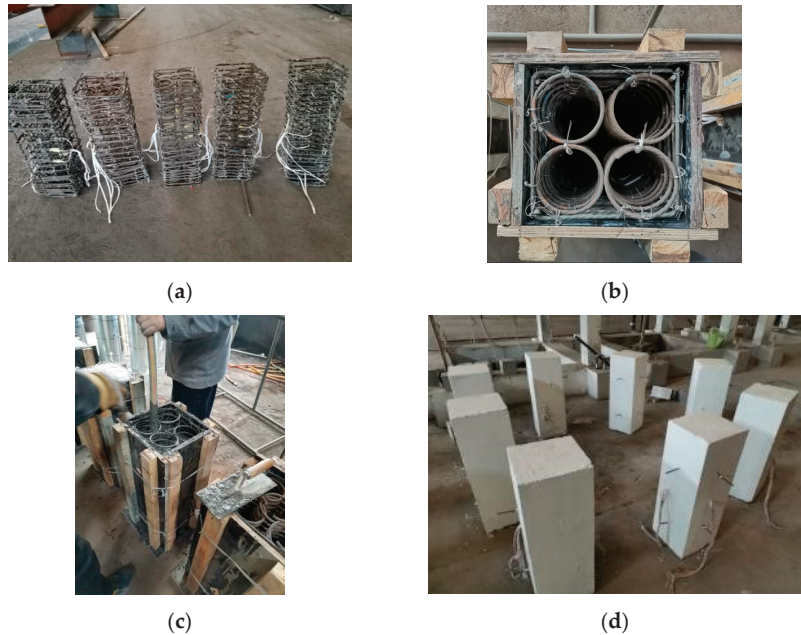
The main production process of constrained concrete column specimen. (a) Binding the steel cage; (b) Building formwork on the outside of the steel cage; (c) Vibrating concrete. (d) Attaching strain gauge to concrete surface.
